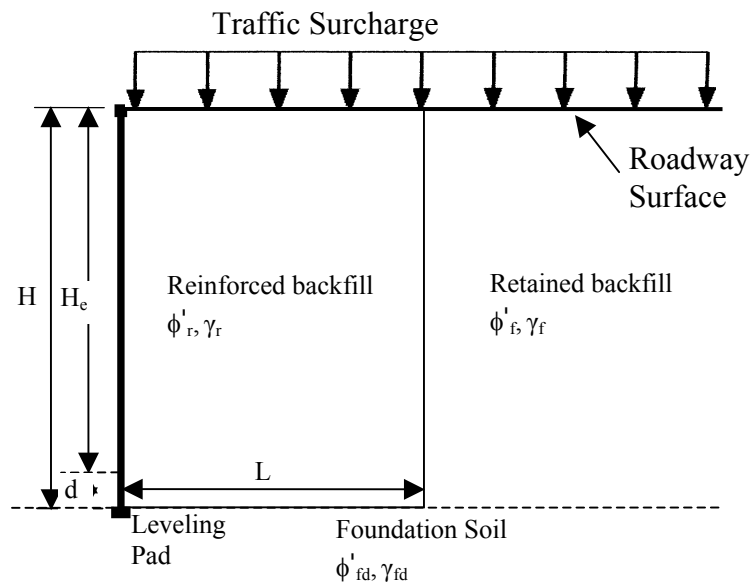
Configuration showing various parameters for analysis of a MSE wall with level backfill and live load surcharge (not-to-scale).
